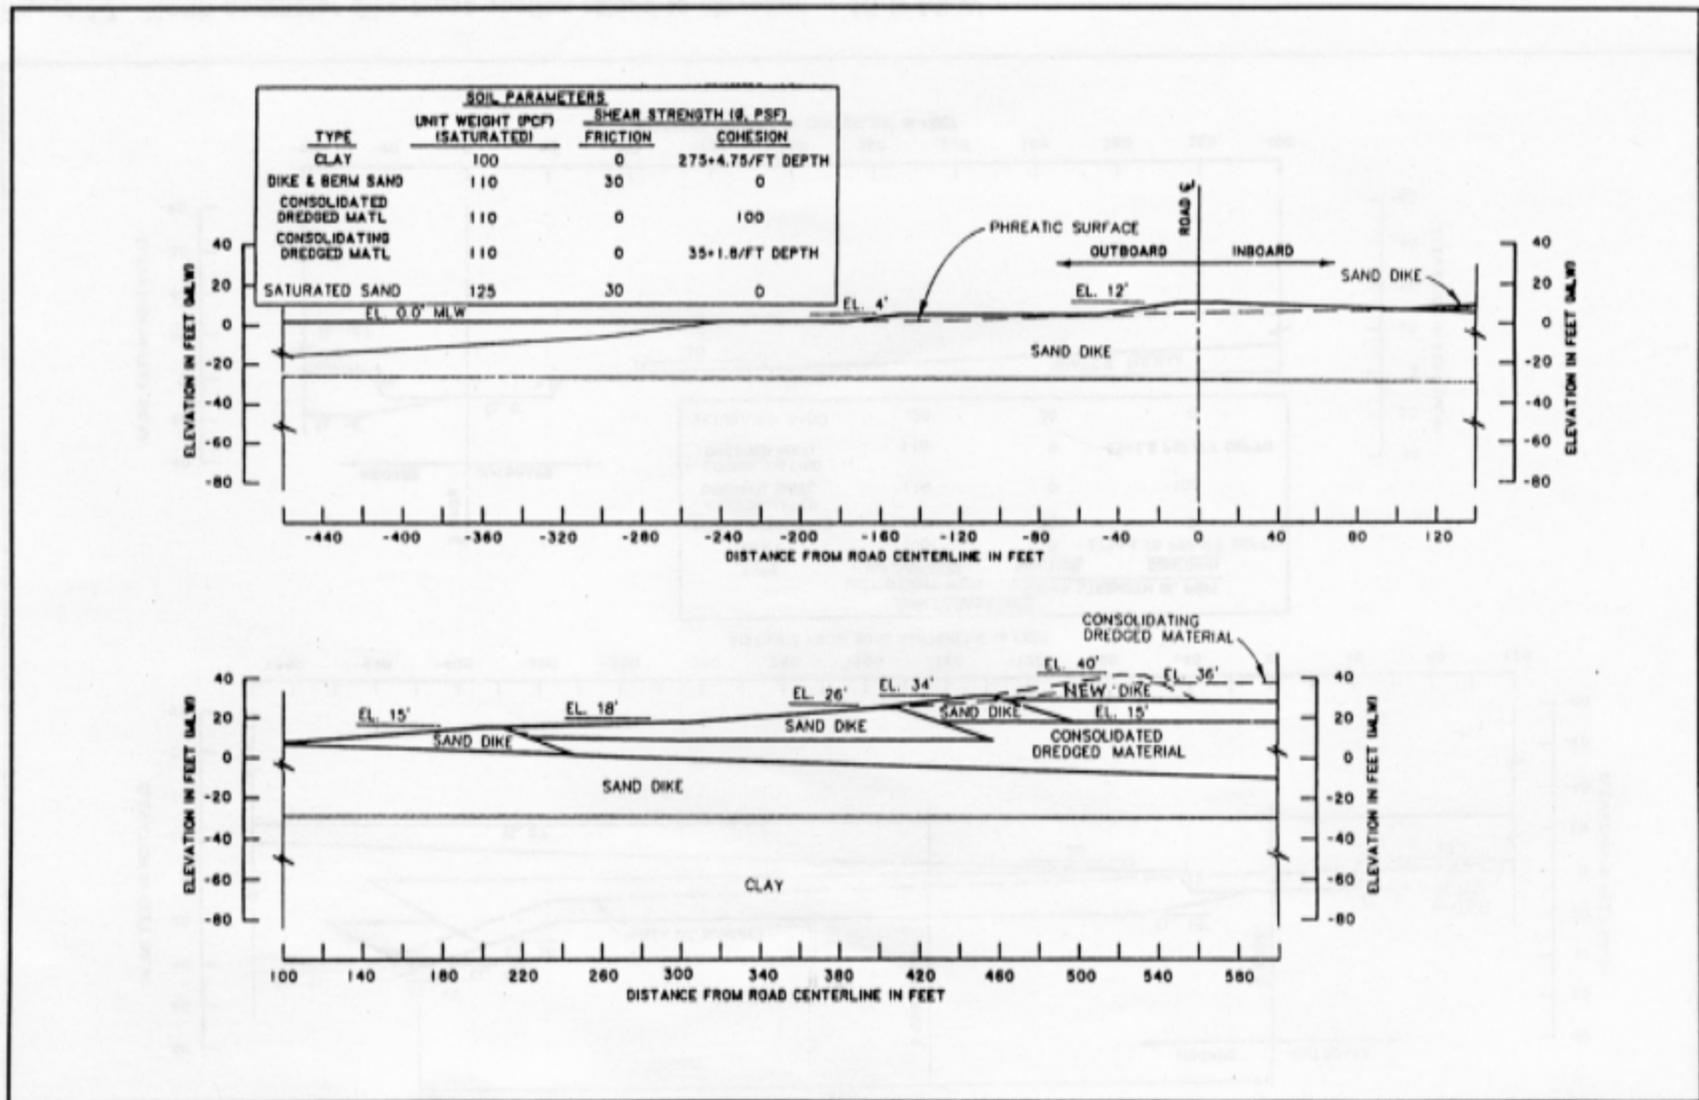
Northwest corner perimeter dike cross-section raised to elevation +40 ft MLW
